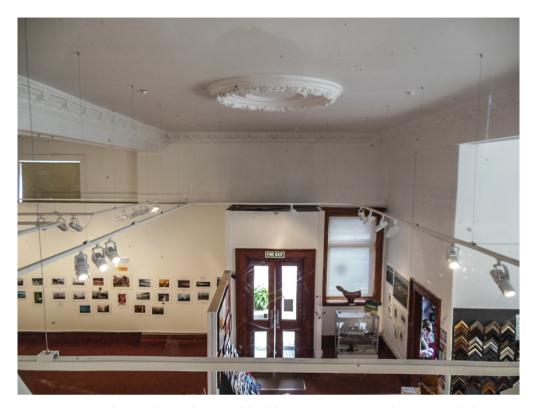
"Before" photo of original building prior to strengthening works being carried out.
